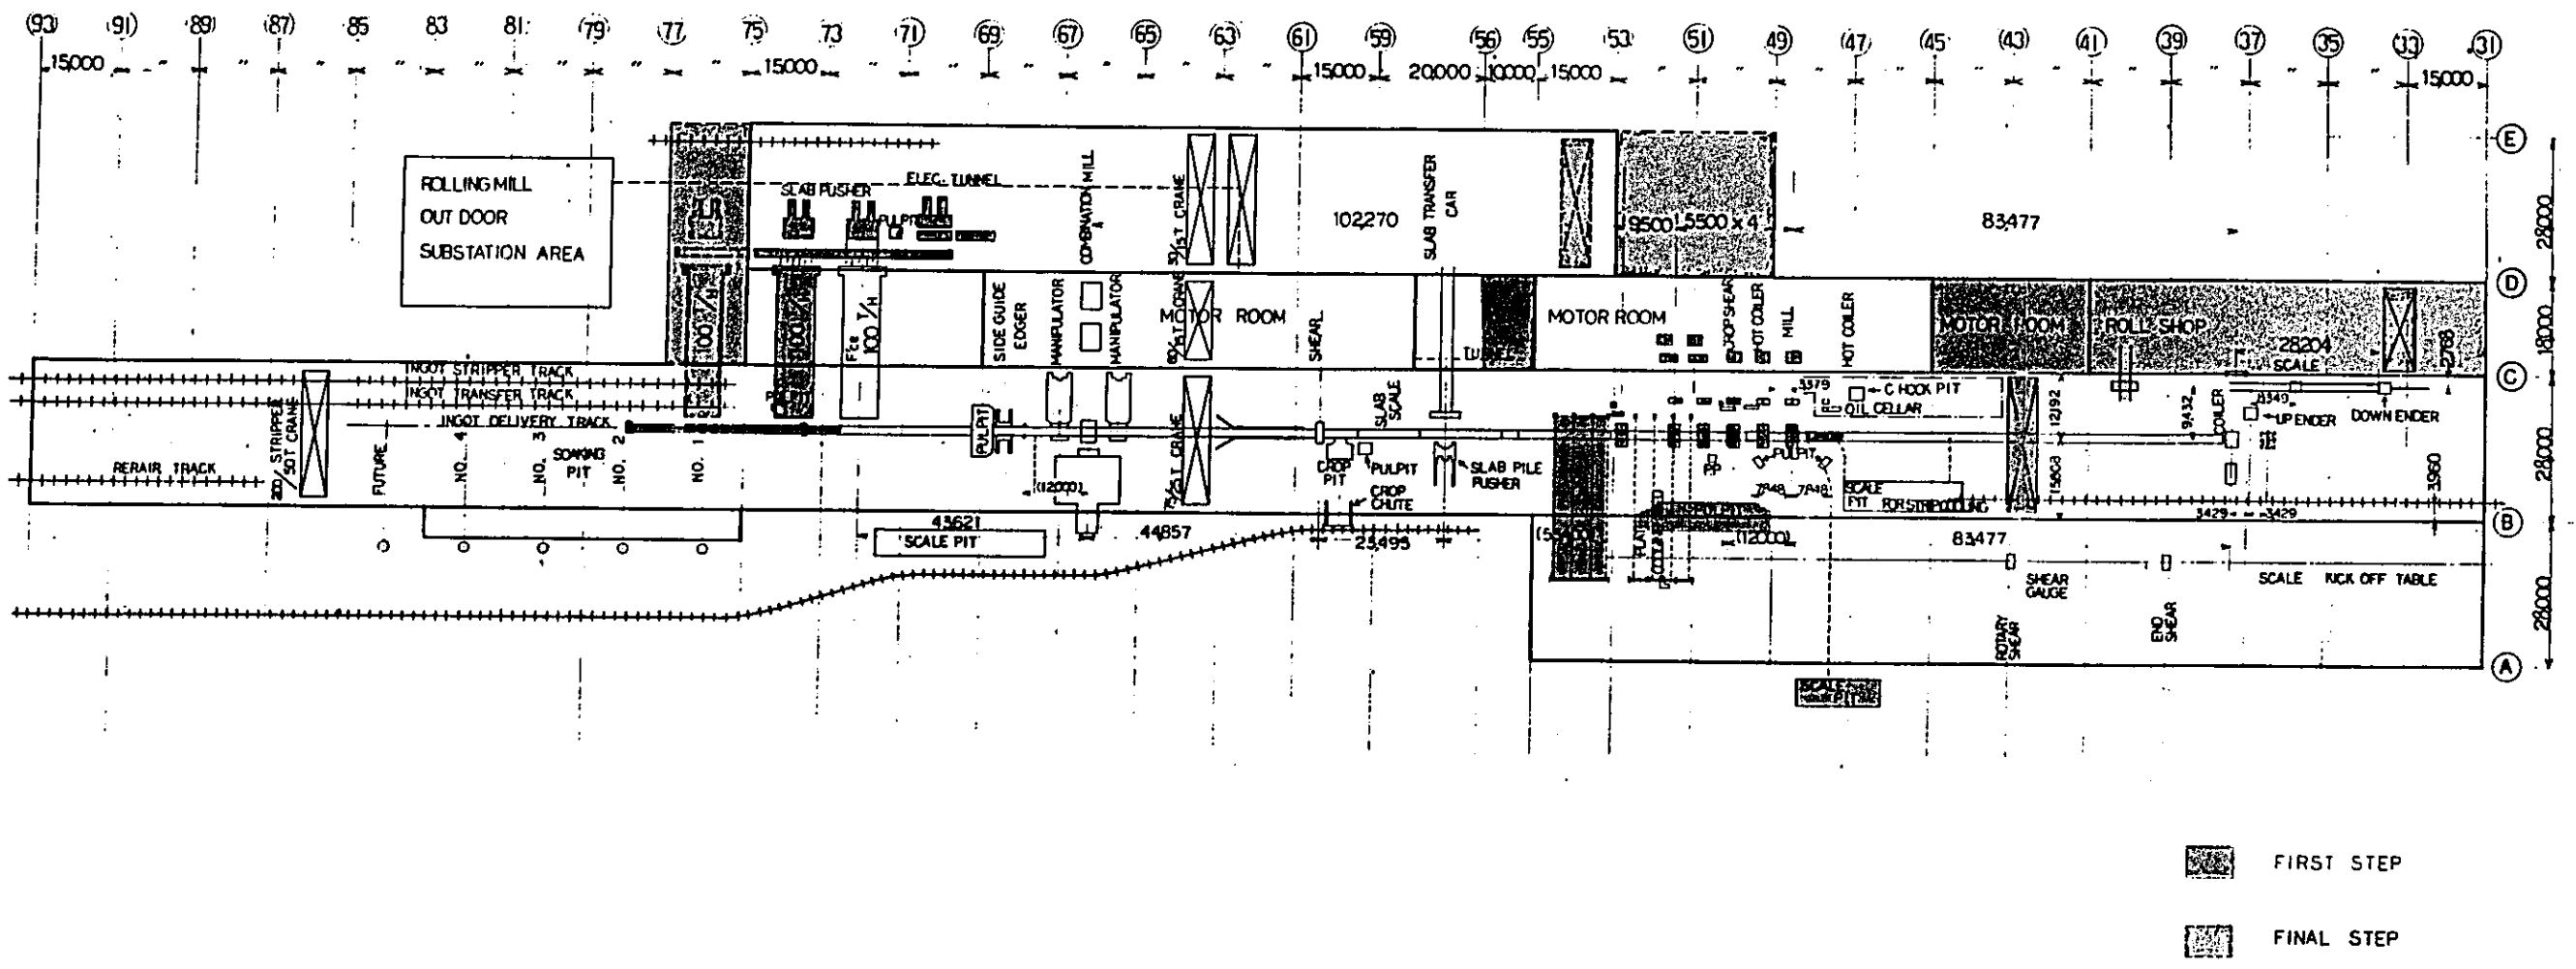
Lay-out NASCO Hot Strip Mill after Modification
